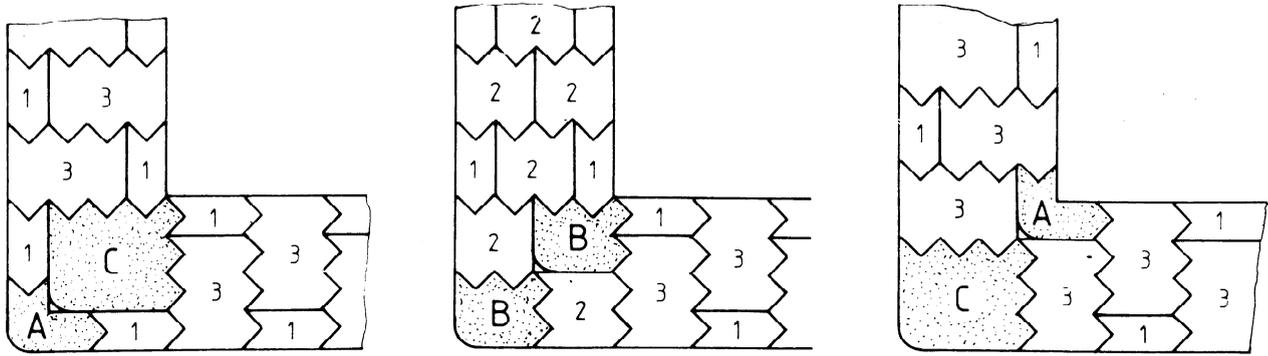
Examples of corner construction with corner bricks and plain bricks
